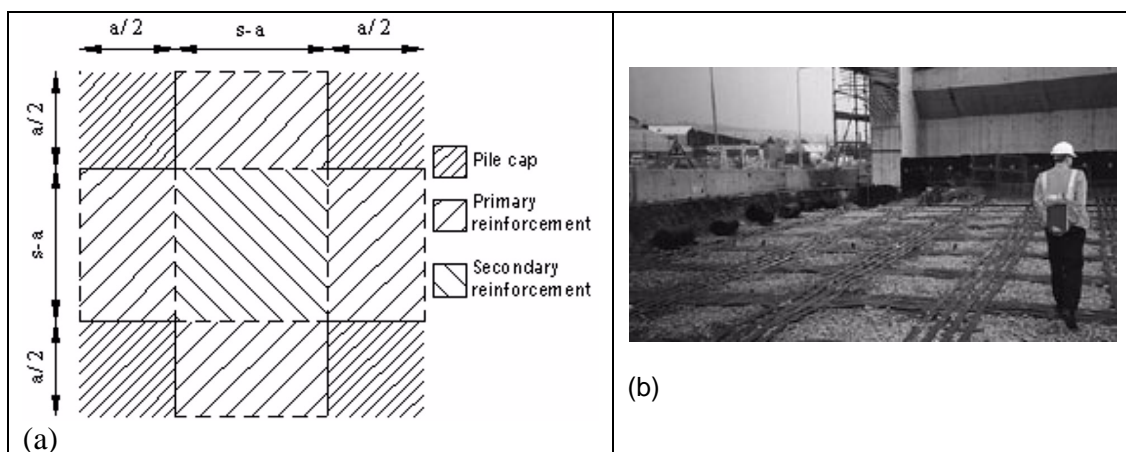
(a) Plan view of base of the embankment, showing locations of primary and secondary reinforcement layers and (b) installation of primary reinforcement.
